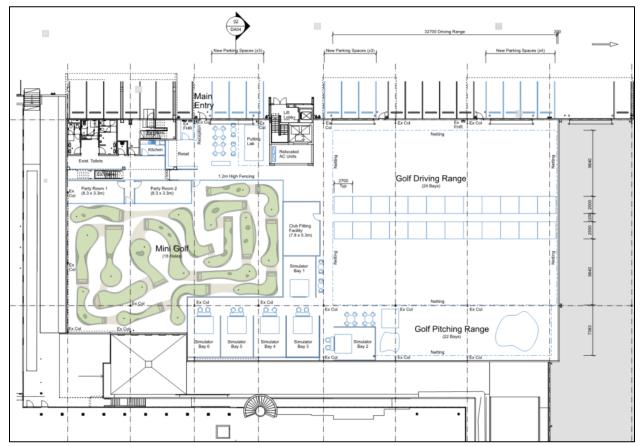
Proposed Floor Plan (Source: SBA Architects, 2022)
